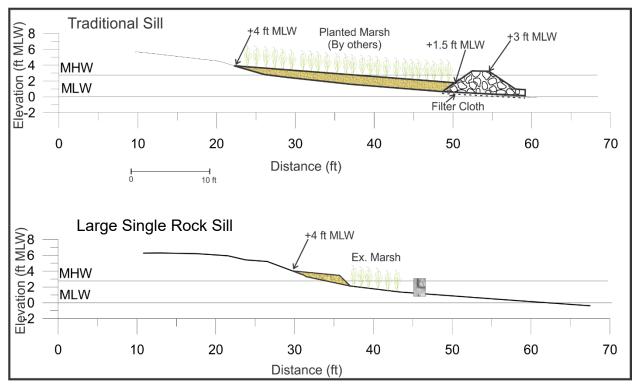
Site 1 and Site 2 typical cross-sections.
